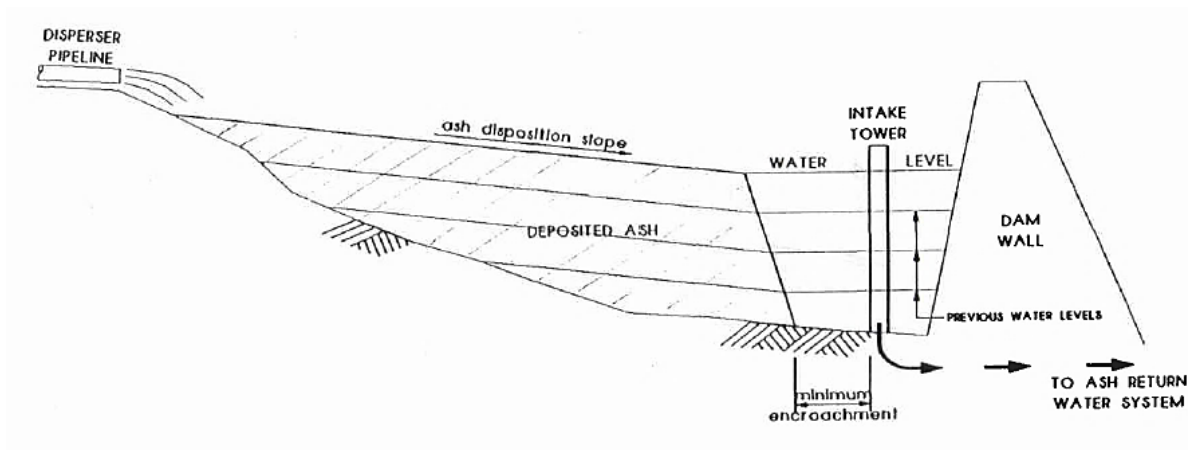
Typical ash dam cross section (Source (AECOM, 2017a))
